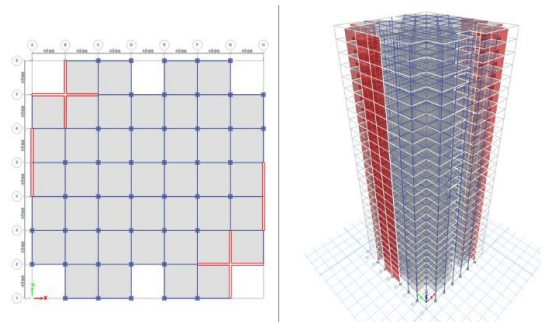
Plan of Structure Plus- Shape shear Wall (Model 4)
